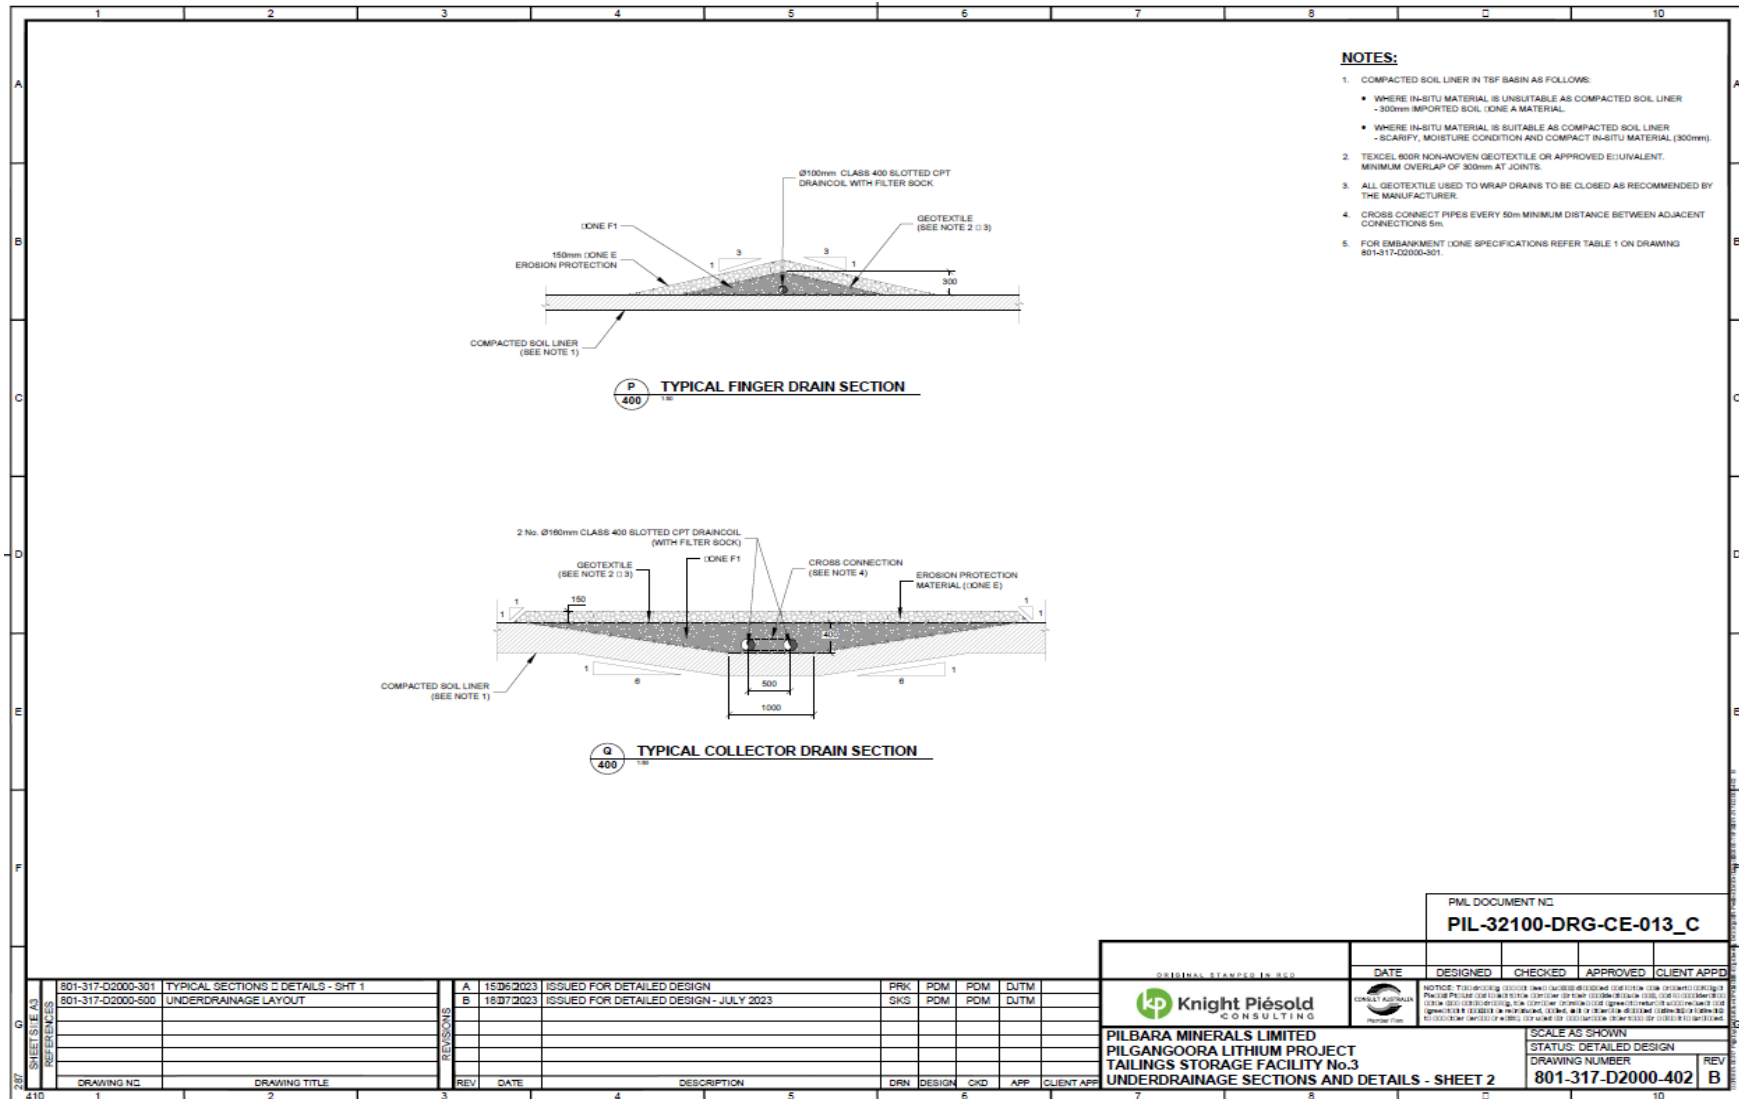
TSF3 Stage 1 underdrainage sections and details – sheet 2
